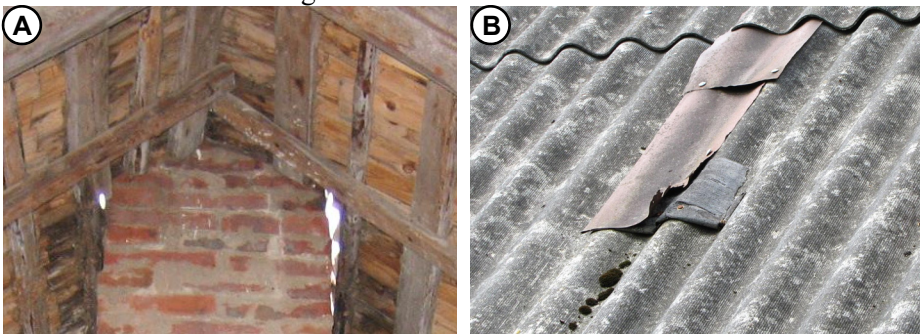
Original roof cover of wooden shag shingles (A – from underside) was frequently covered with asbestos cement boards (B). Typical leaks: around the chimney (A) and due to excessively old roof covering (B).
